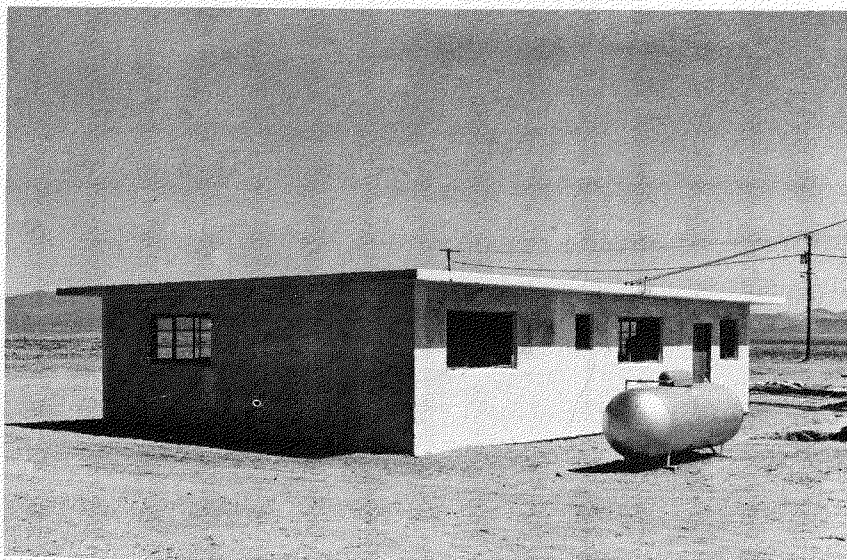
Reinforced precast concrete house before a nuclear explosion, Nevada Test Site.
